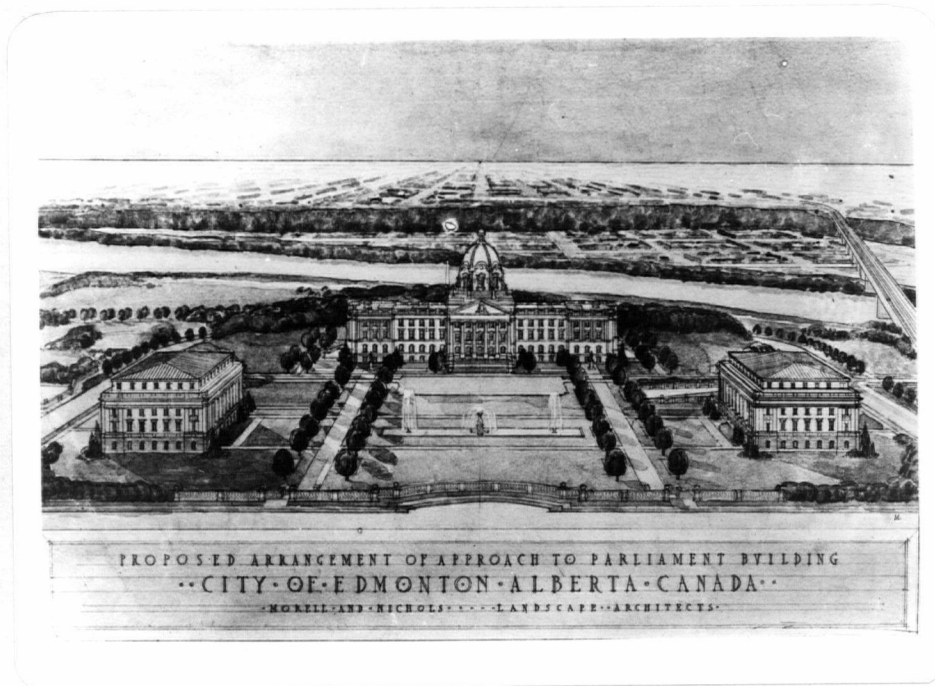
Edmonton: Proposed approach to Parliament Building. (Source: Glenbow-Alberta Institute)
